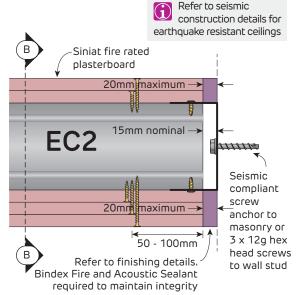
Sliding Connection EC2 Slotted Deflection Head Track Section
